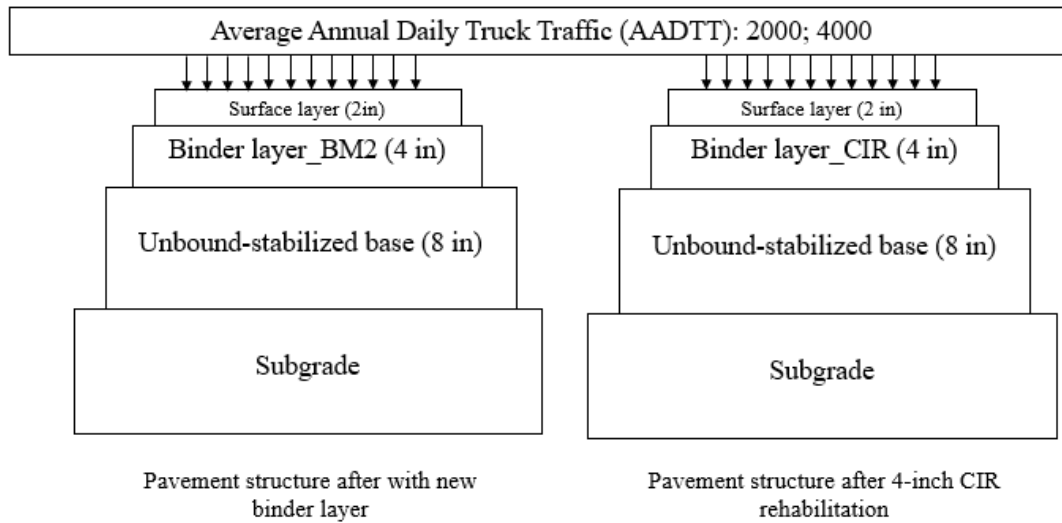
Pavement models for rehabilitation with new BM2 layer (left) and CIR technique (right).
